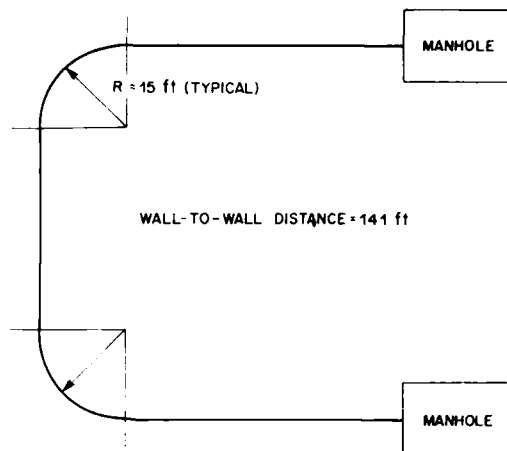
Plan view of conduit system used for cable installation tests. This particular conduit run is divided into fourteen sections: two horizontal straight sections, six grades, two horizontal bends, and four vertical-plane bends.
